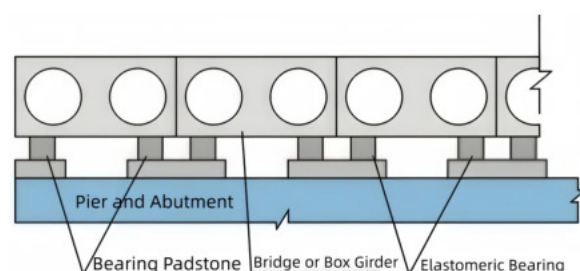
Bearing Padstone Arrangement for Slab Girders and Box Girders
